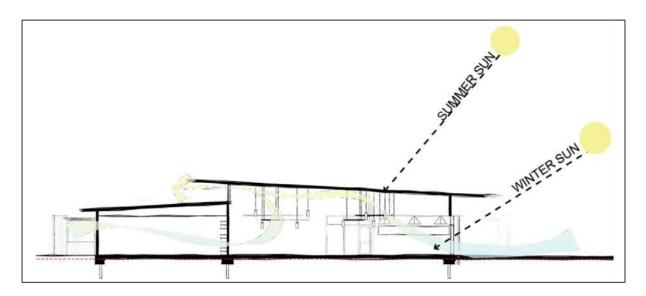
| Typical primary school building ventilation and solar access (source: RtS 2019)
